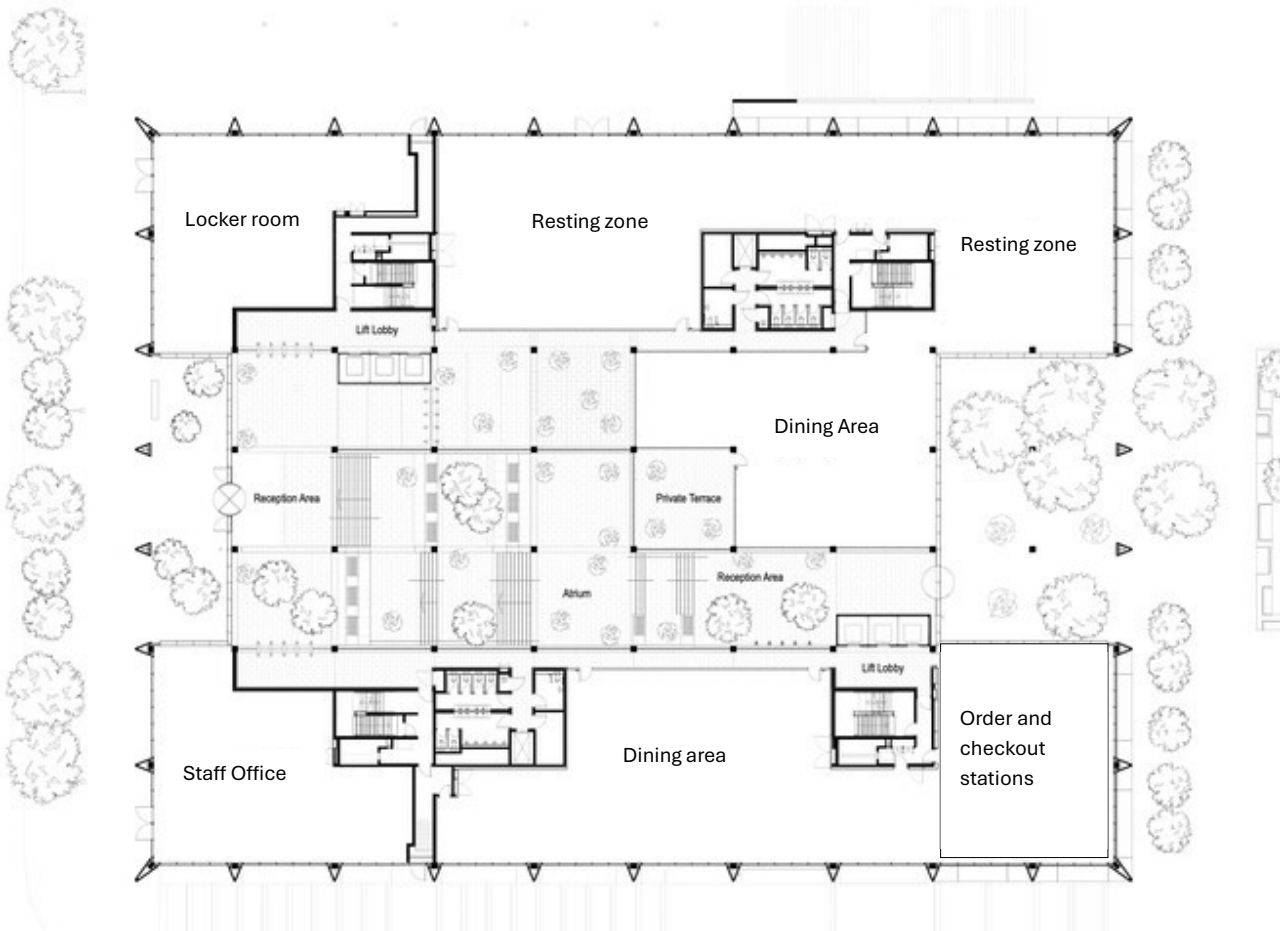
First floor plan (modification of Norman Foster's original design plan)
